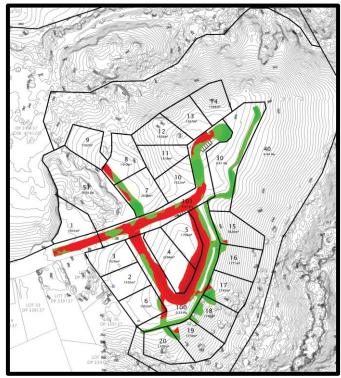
Earthworks Plan – Red = Cut Green = Fill (Source: Application)
